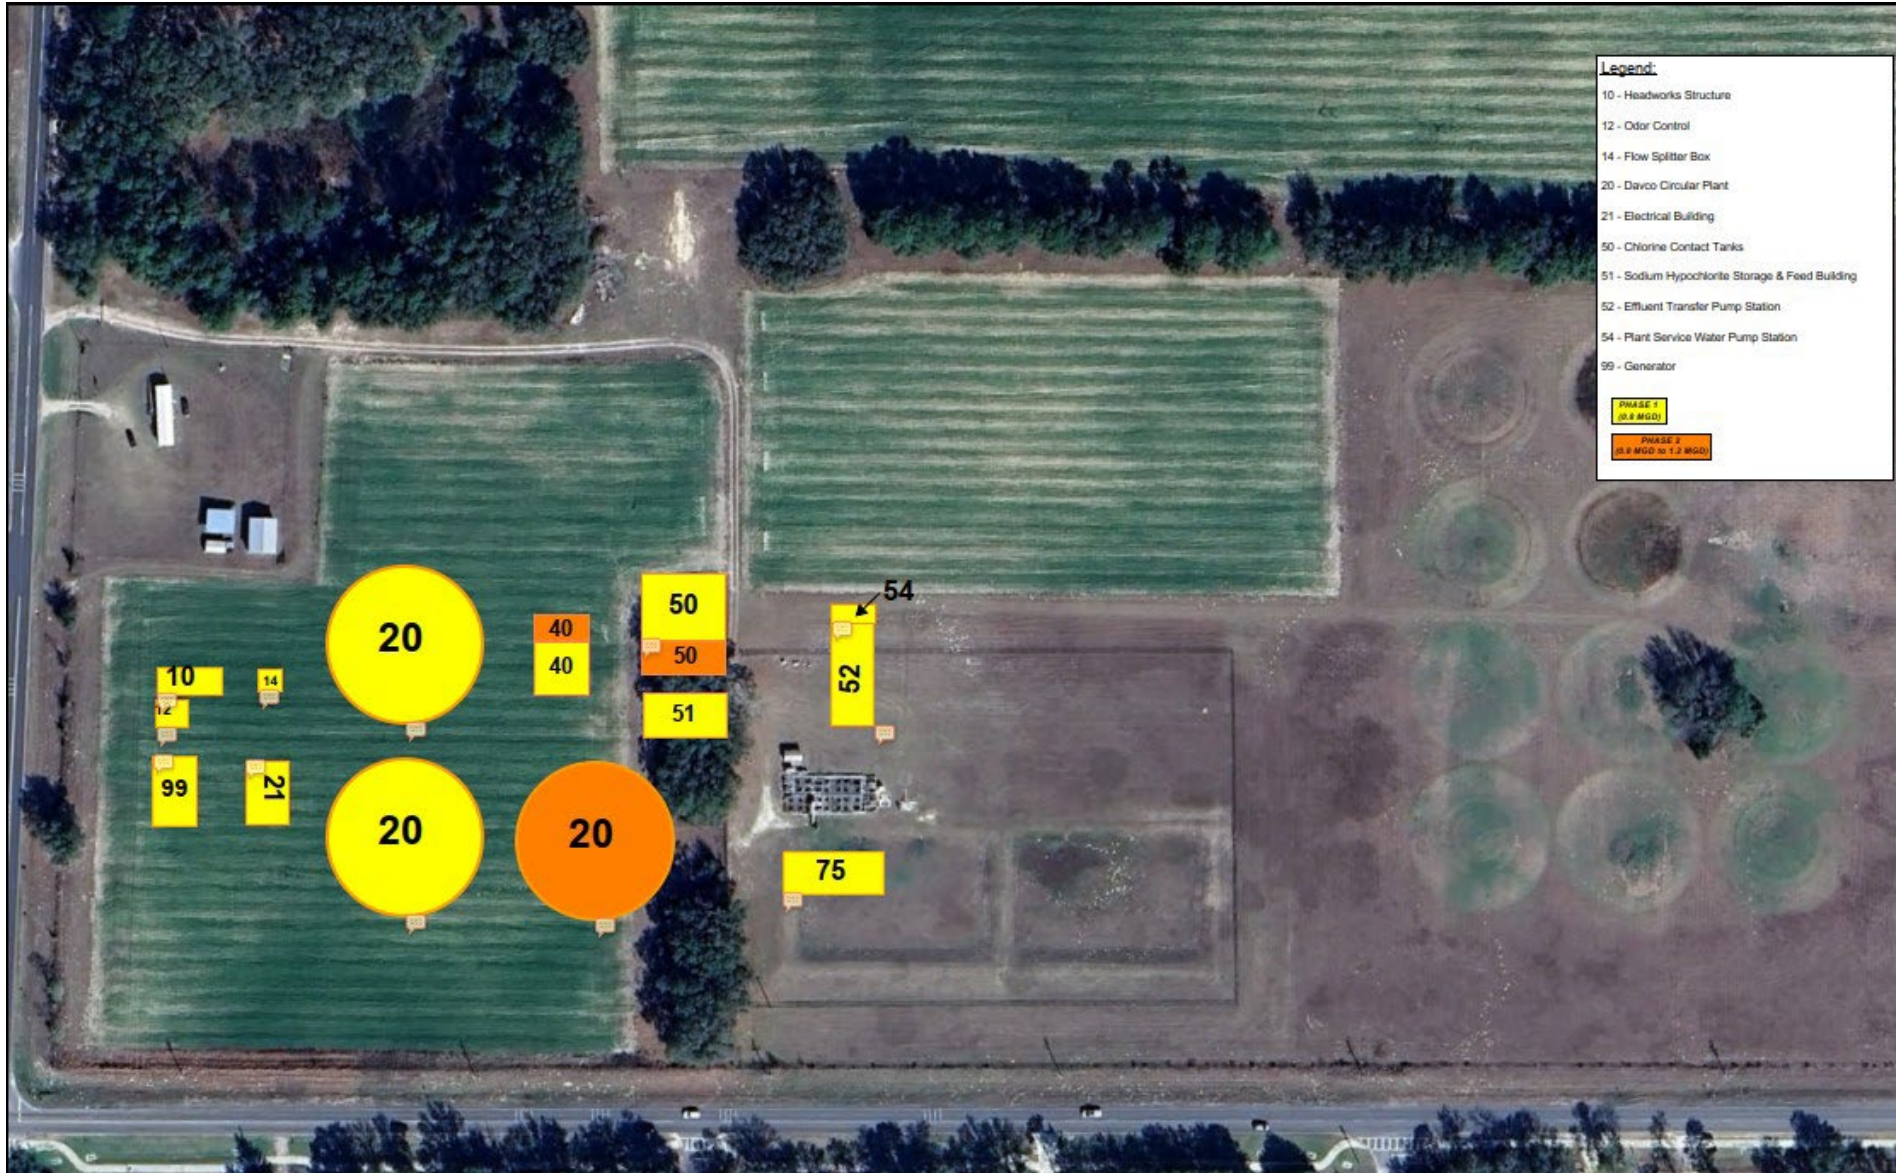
and Figure 5.2 presents conceptual site plan of Alternative 1 (Carrousel Oxidation Ditch) and Alternative 2 (Davco circular plant), respectively.
